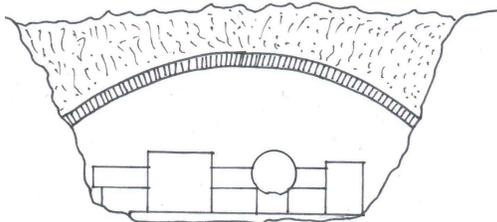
Full arched structure in a Lunar valley built with layered building elements, covered by Lunar regolith
